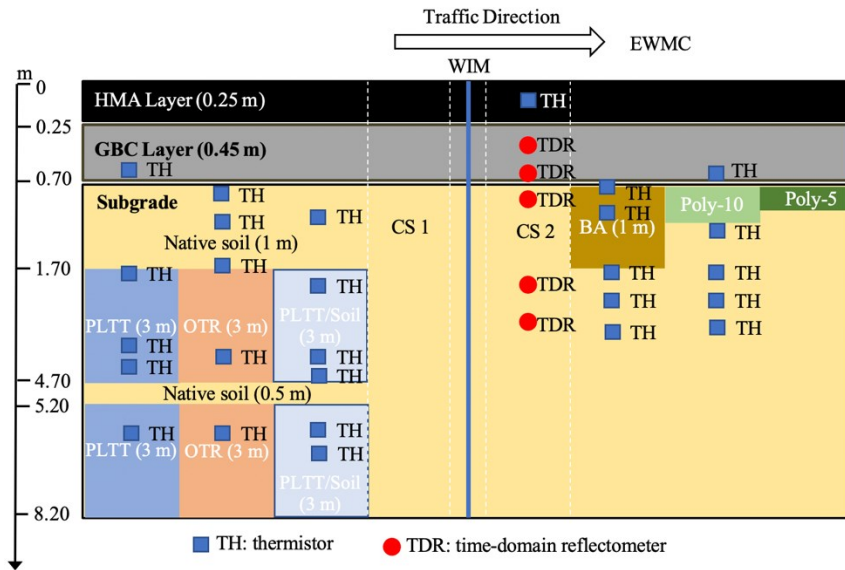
Cross-section of the Integrated Road Research Facility test road showing test and control sections and sensor placement
